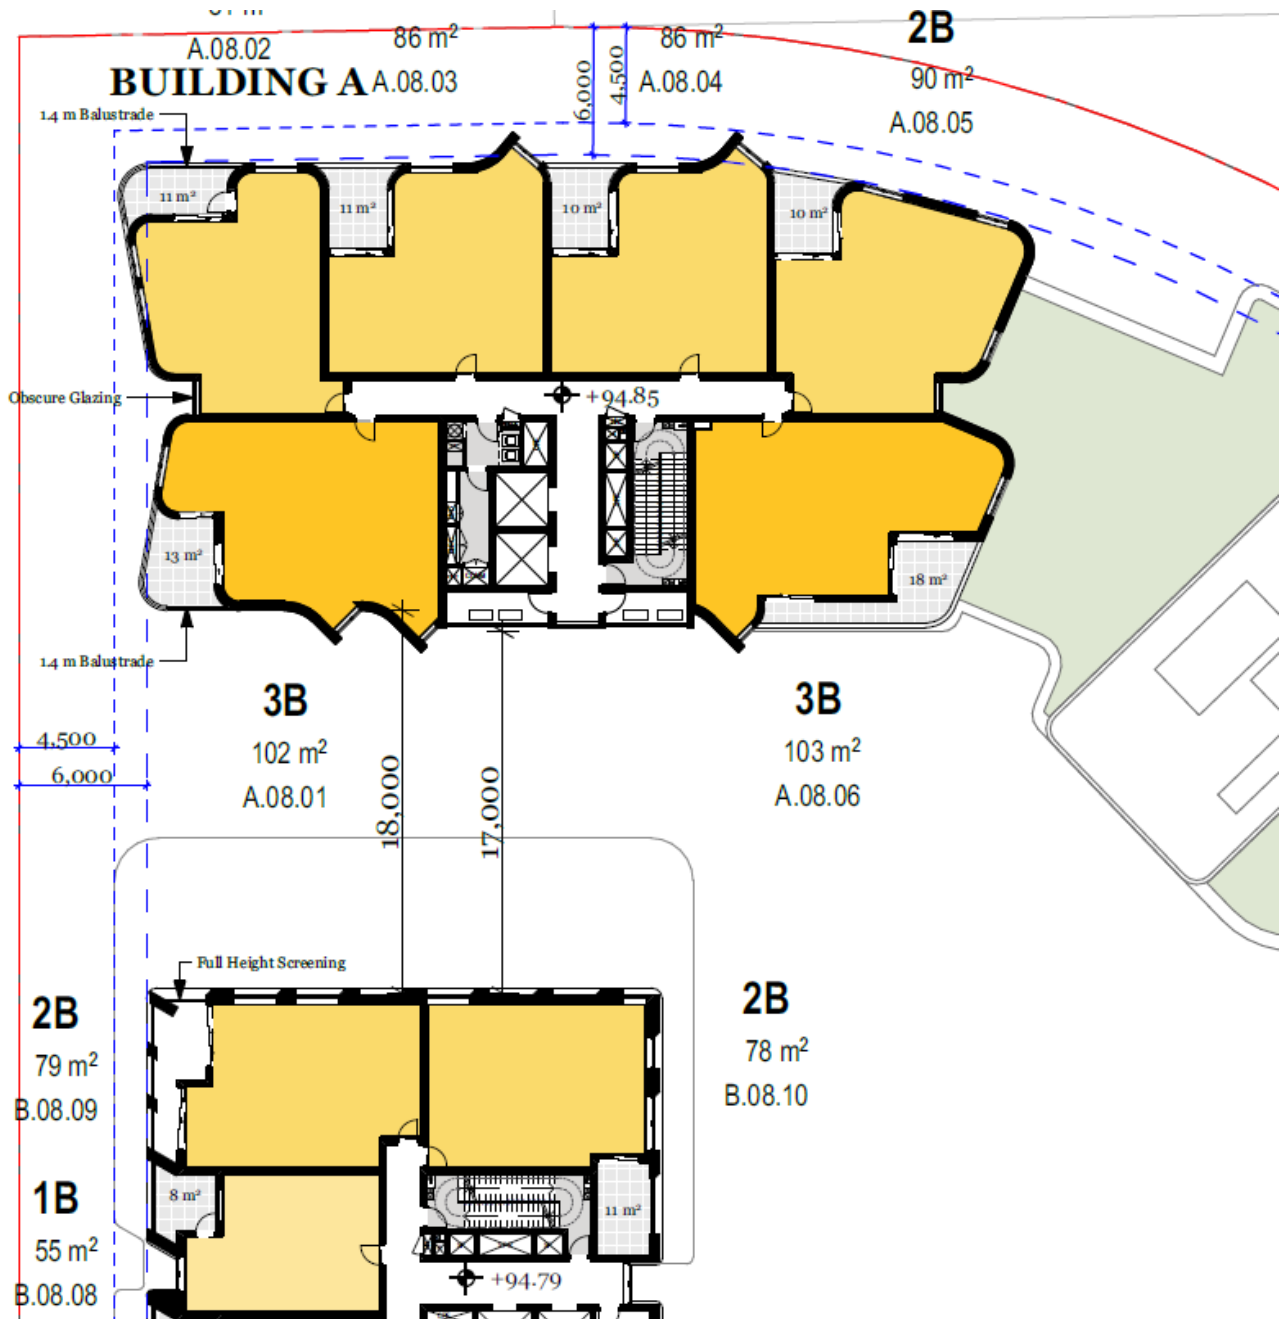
Typical floor plan – view orientation to mitigation 18m setback between Building A and B
